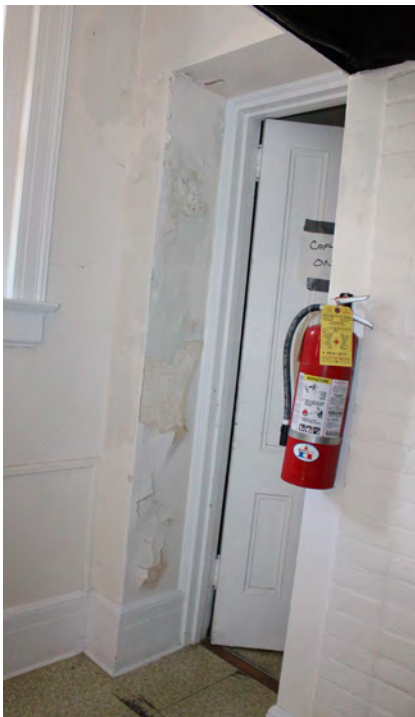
Peeling paint and delaminated plaster in Kitchen (116) at door to closet. (HA, 2015)
